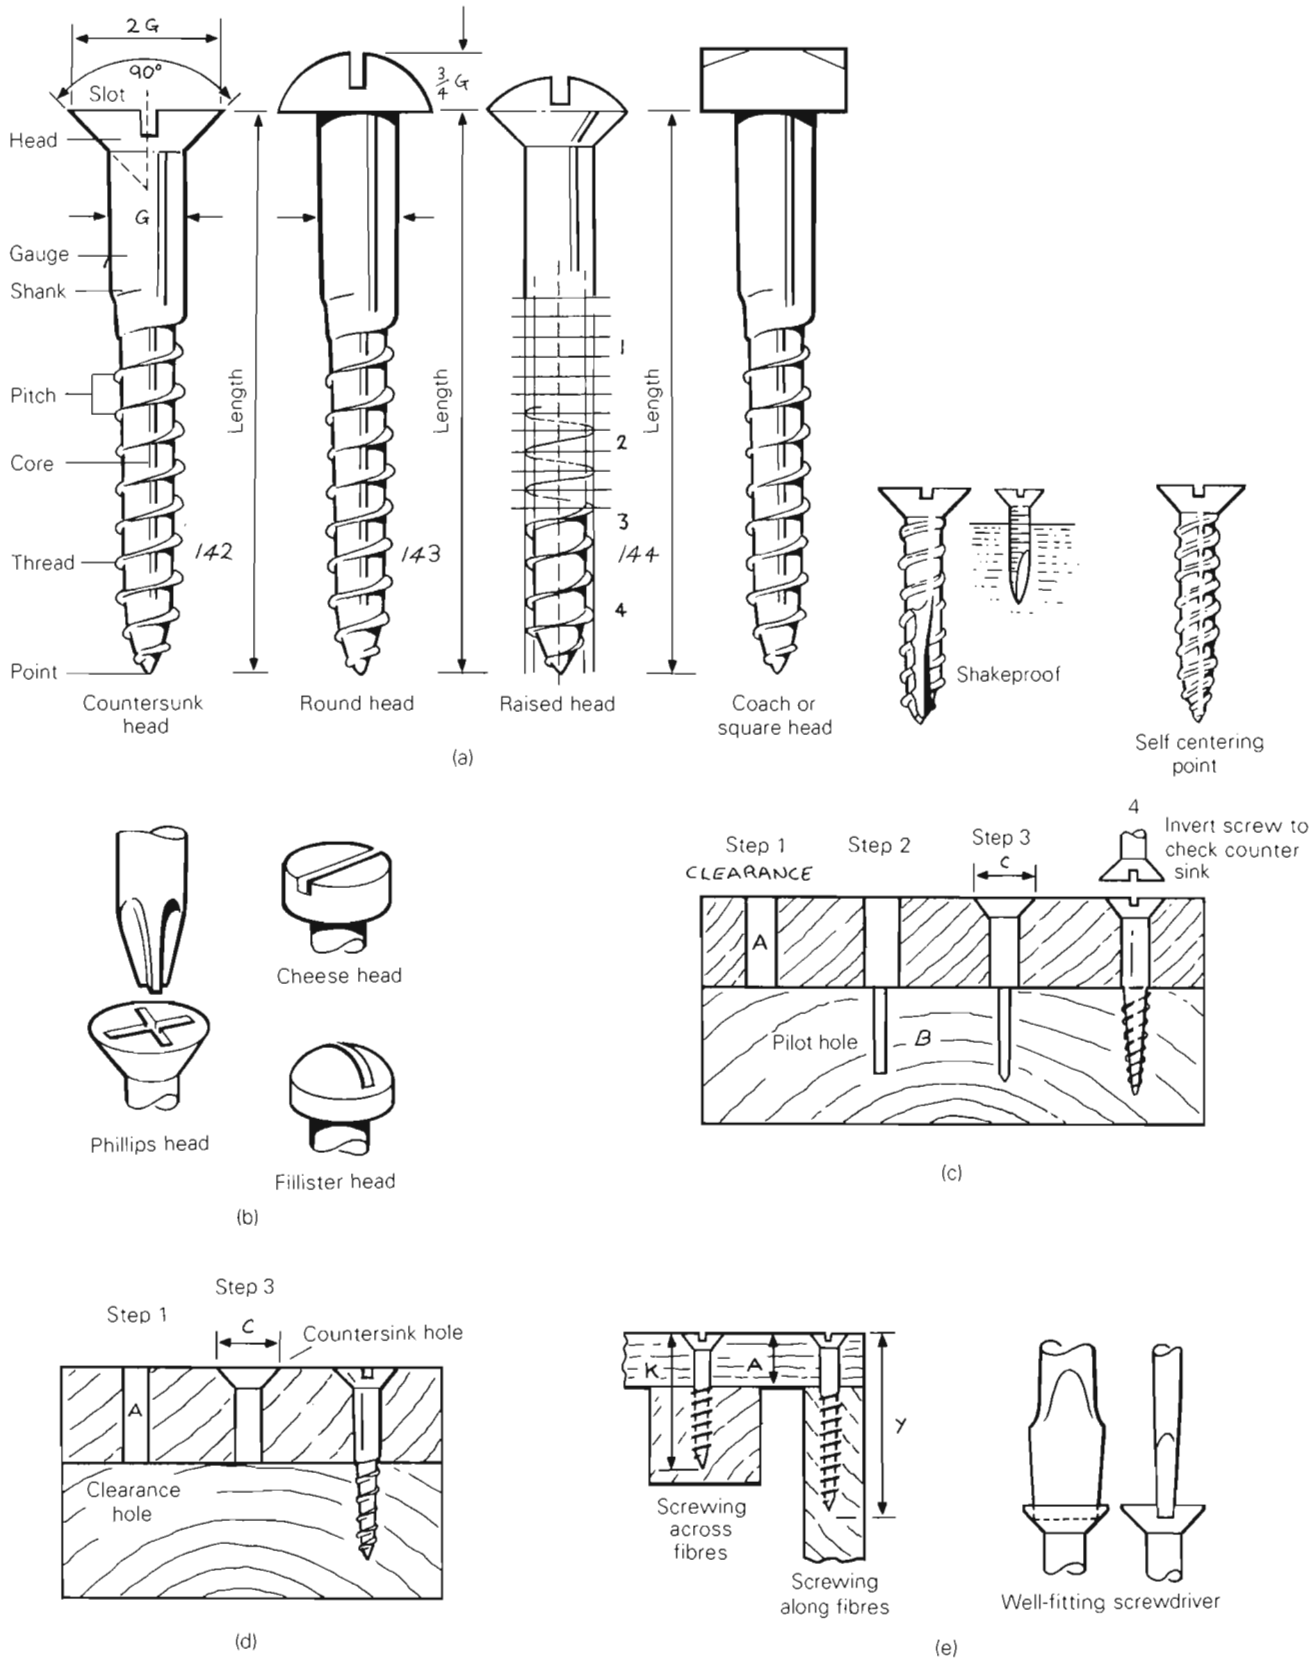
Screws and screwing: (a) screws, (b) screwheads, (c) screwing in hardwood, (d) screwing in softwood, (e) screwing in fibres.
